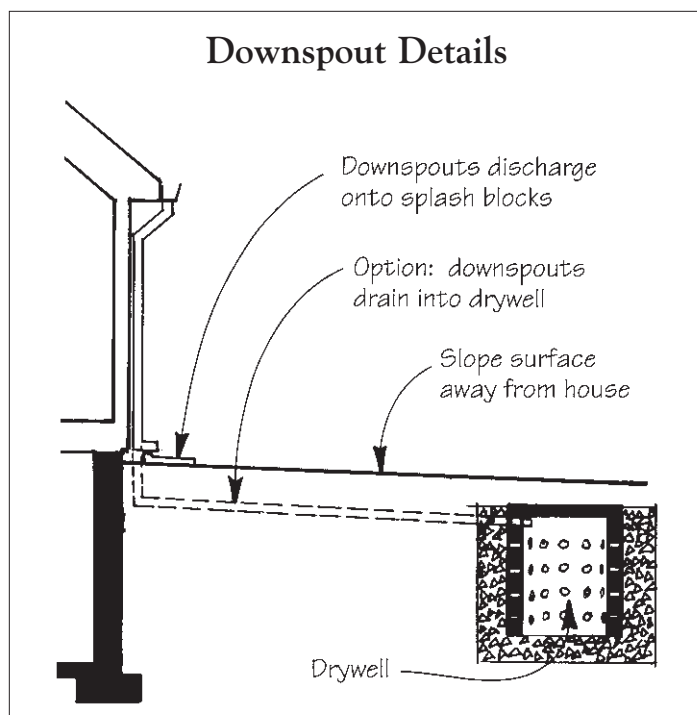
Where gutters are used, be sure to include splash blocks below the downspouts, or tie the leaders to a dry well with underground piping. Never tie your gutters into the foundation drain system.
